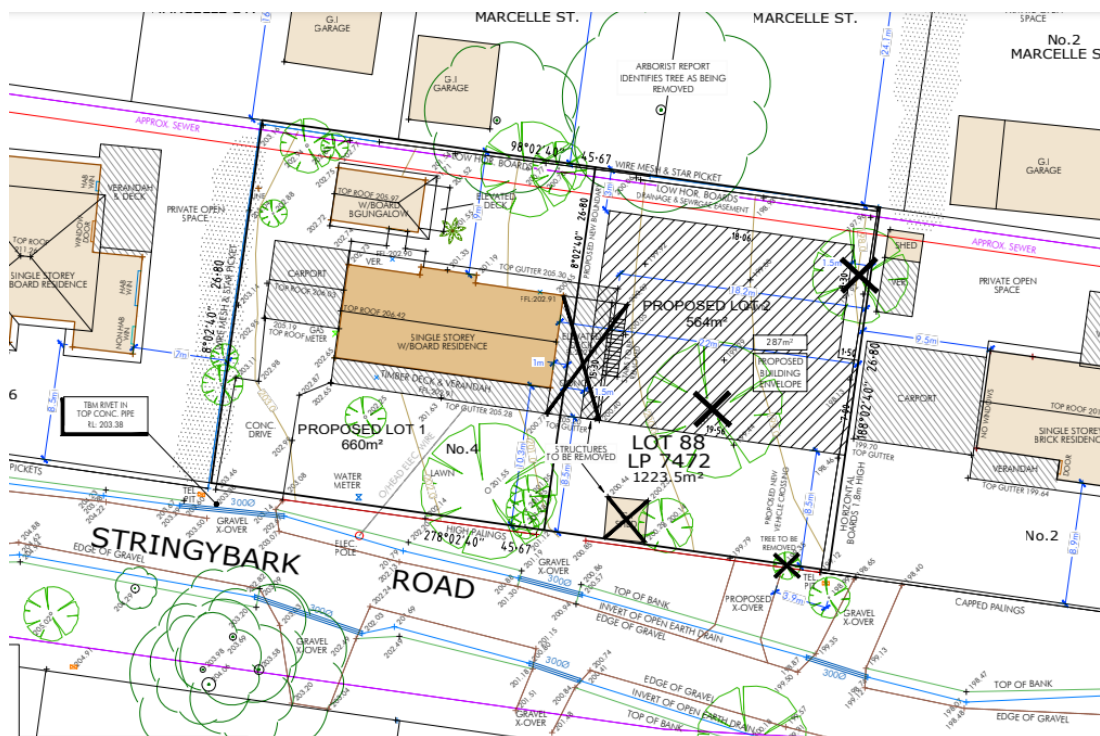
Proposed Plan of Subdivision, also showing proposed tree removal. Source: Nilsson, Noel & Holmes Surveyors, 2023.
